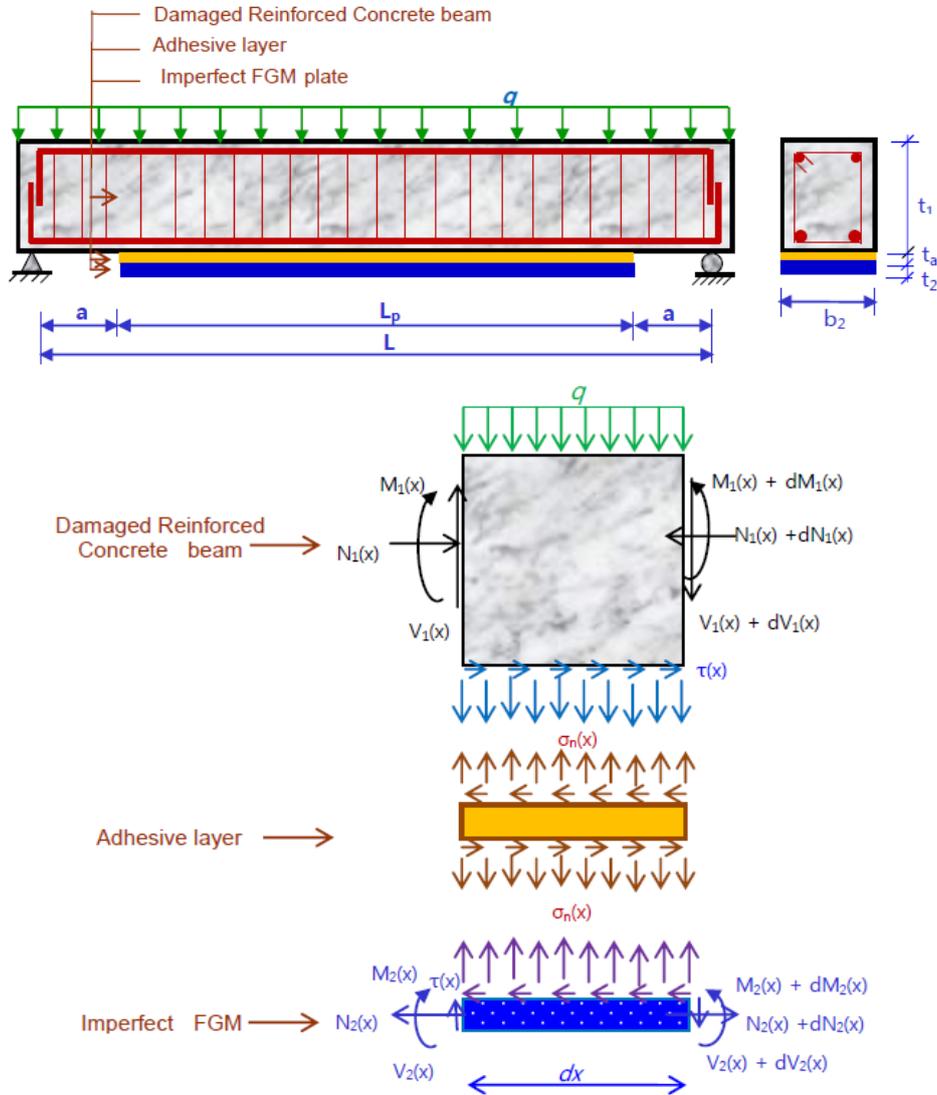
Simply supported damaged reinforced concrete beam strengthened bonded with porous FGM plate
